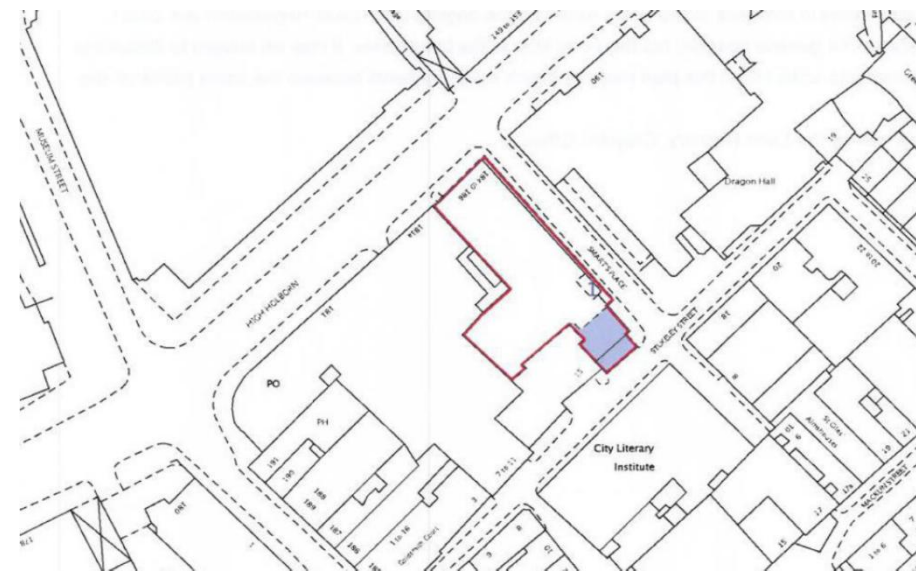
182-184 High Holborn Site Boundary, extract from SPPARC's parameter plan drawings
